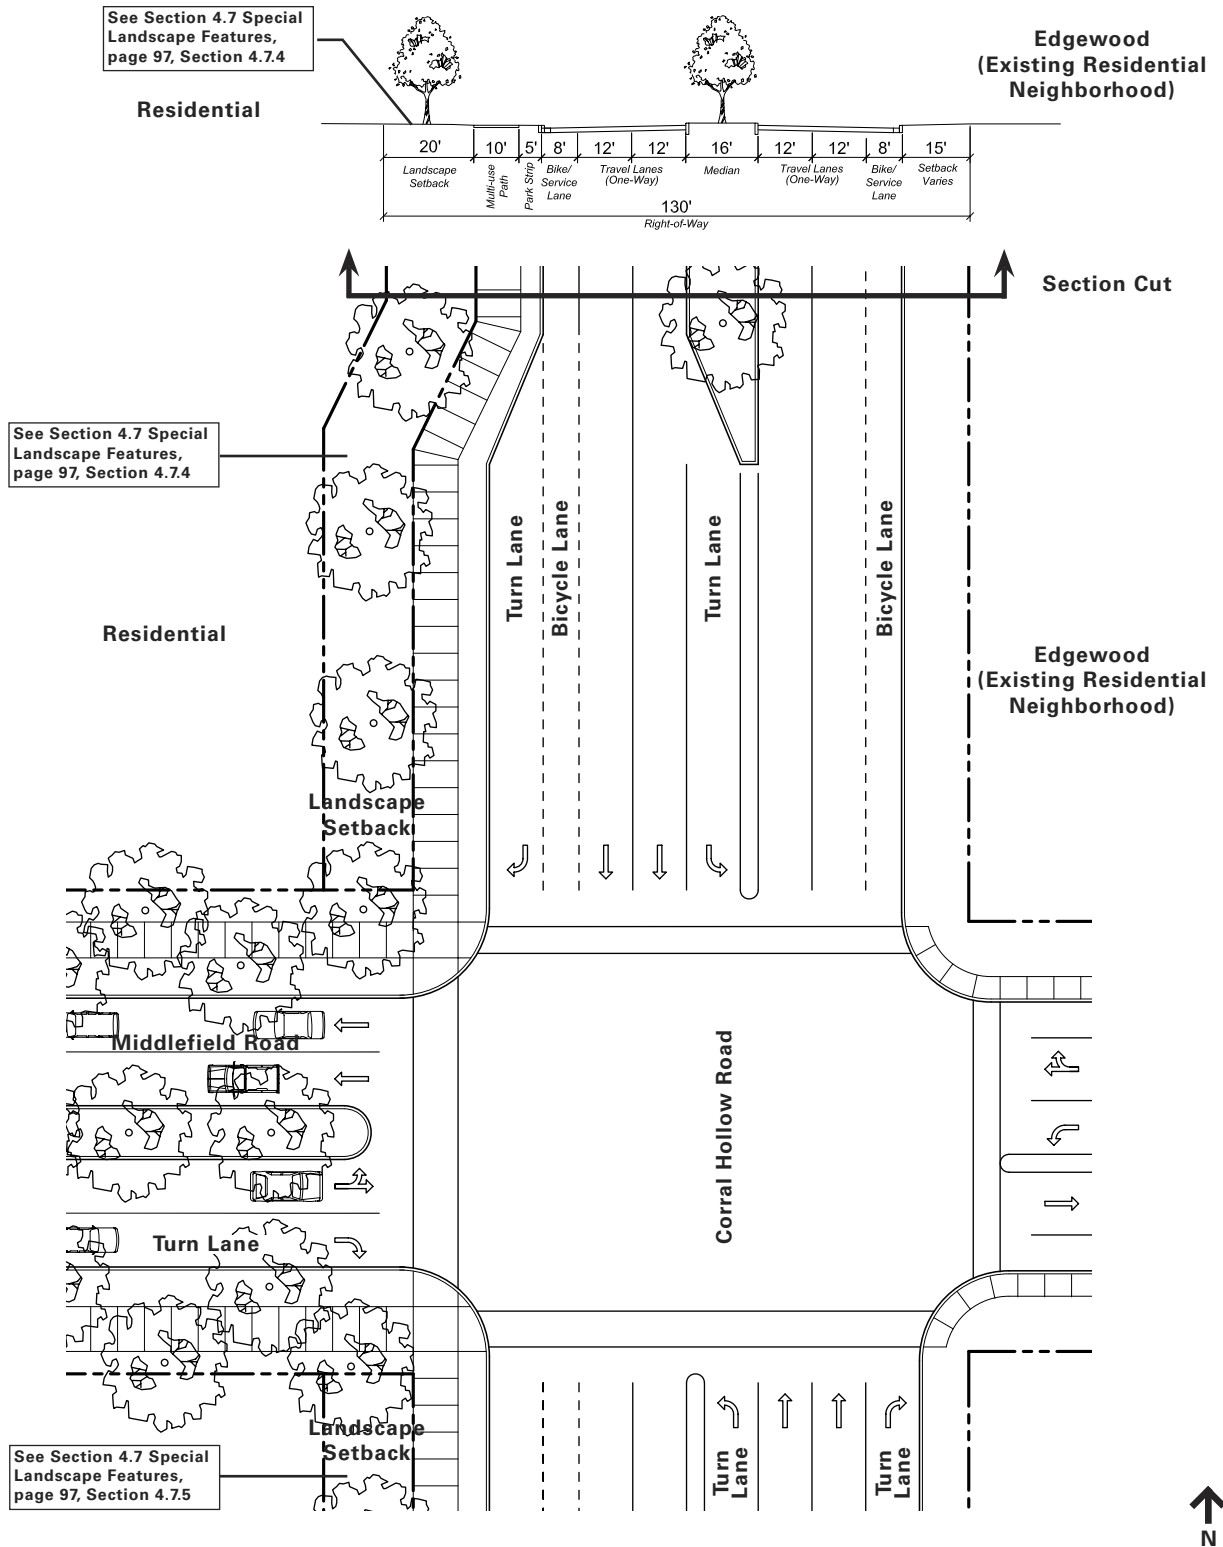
Interim Section and Plan: Regional Arterial – Corral Hollow Road, Designation B (Interim Condition)
